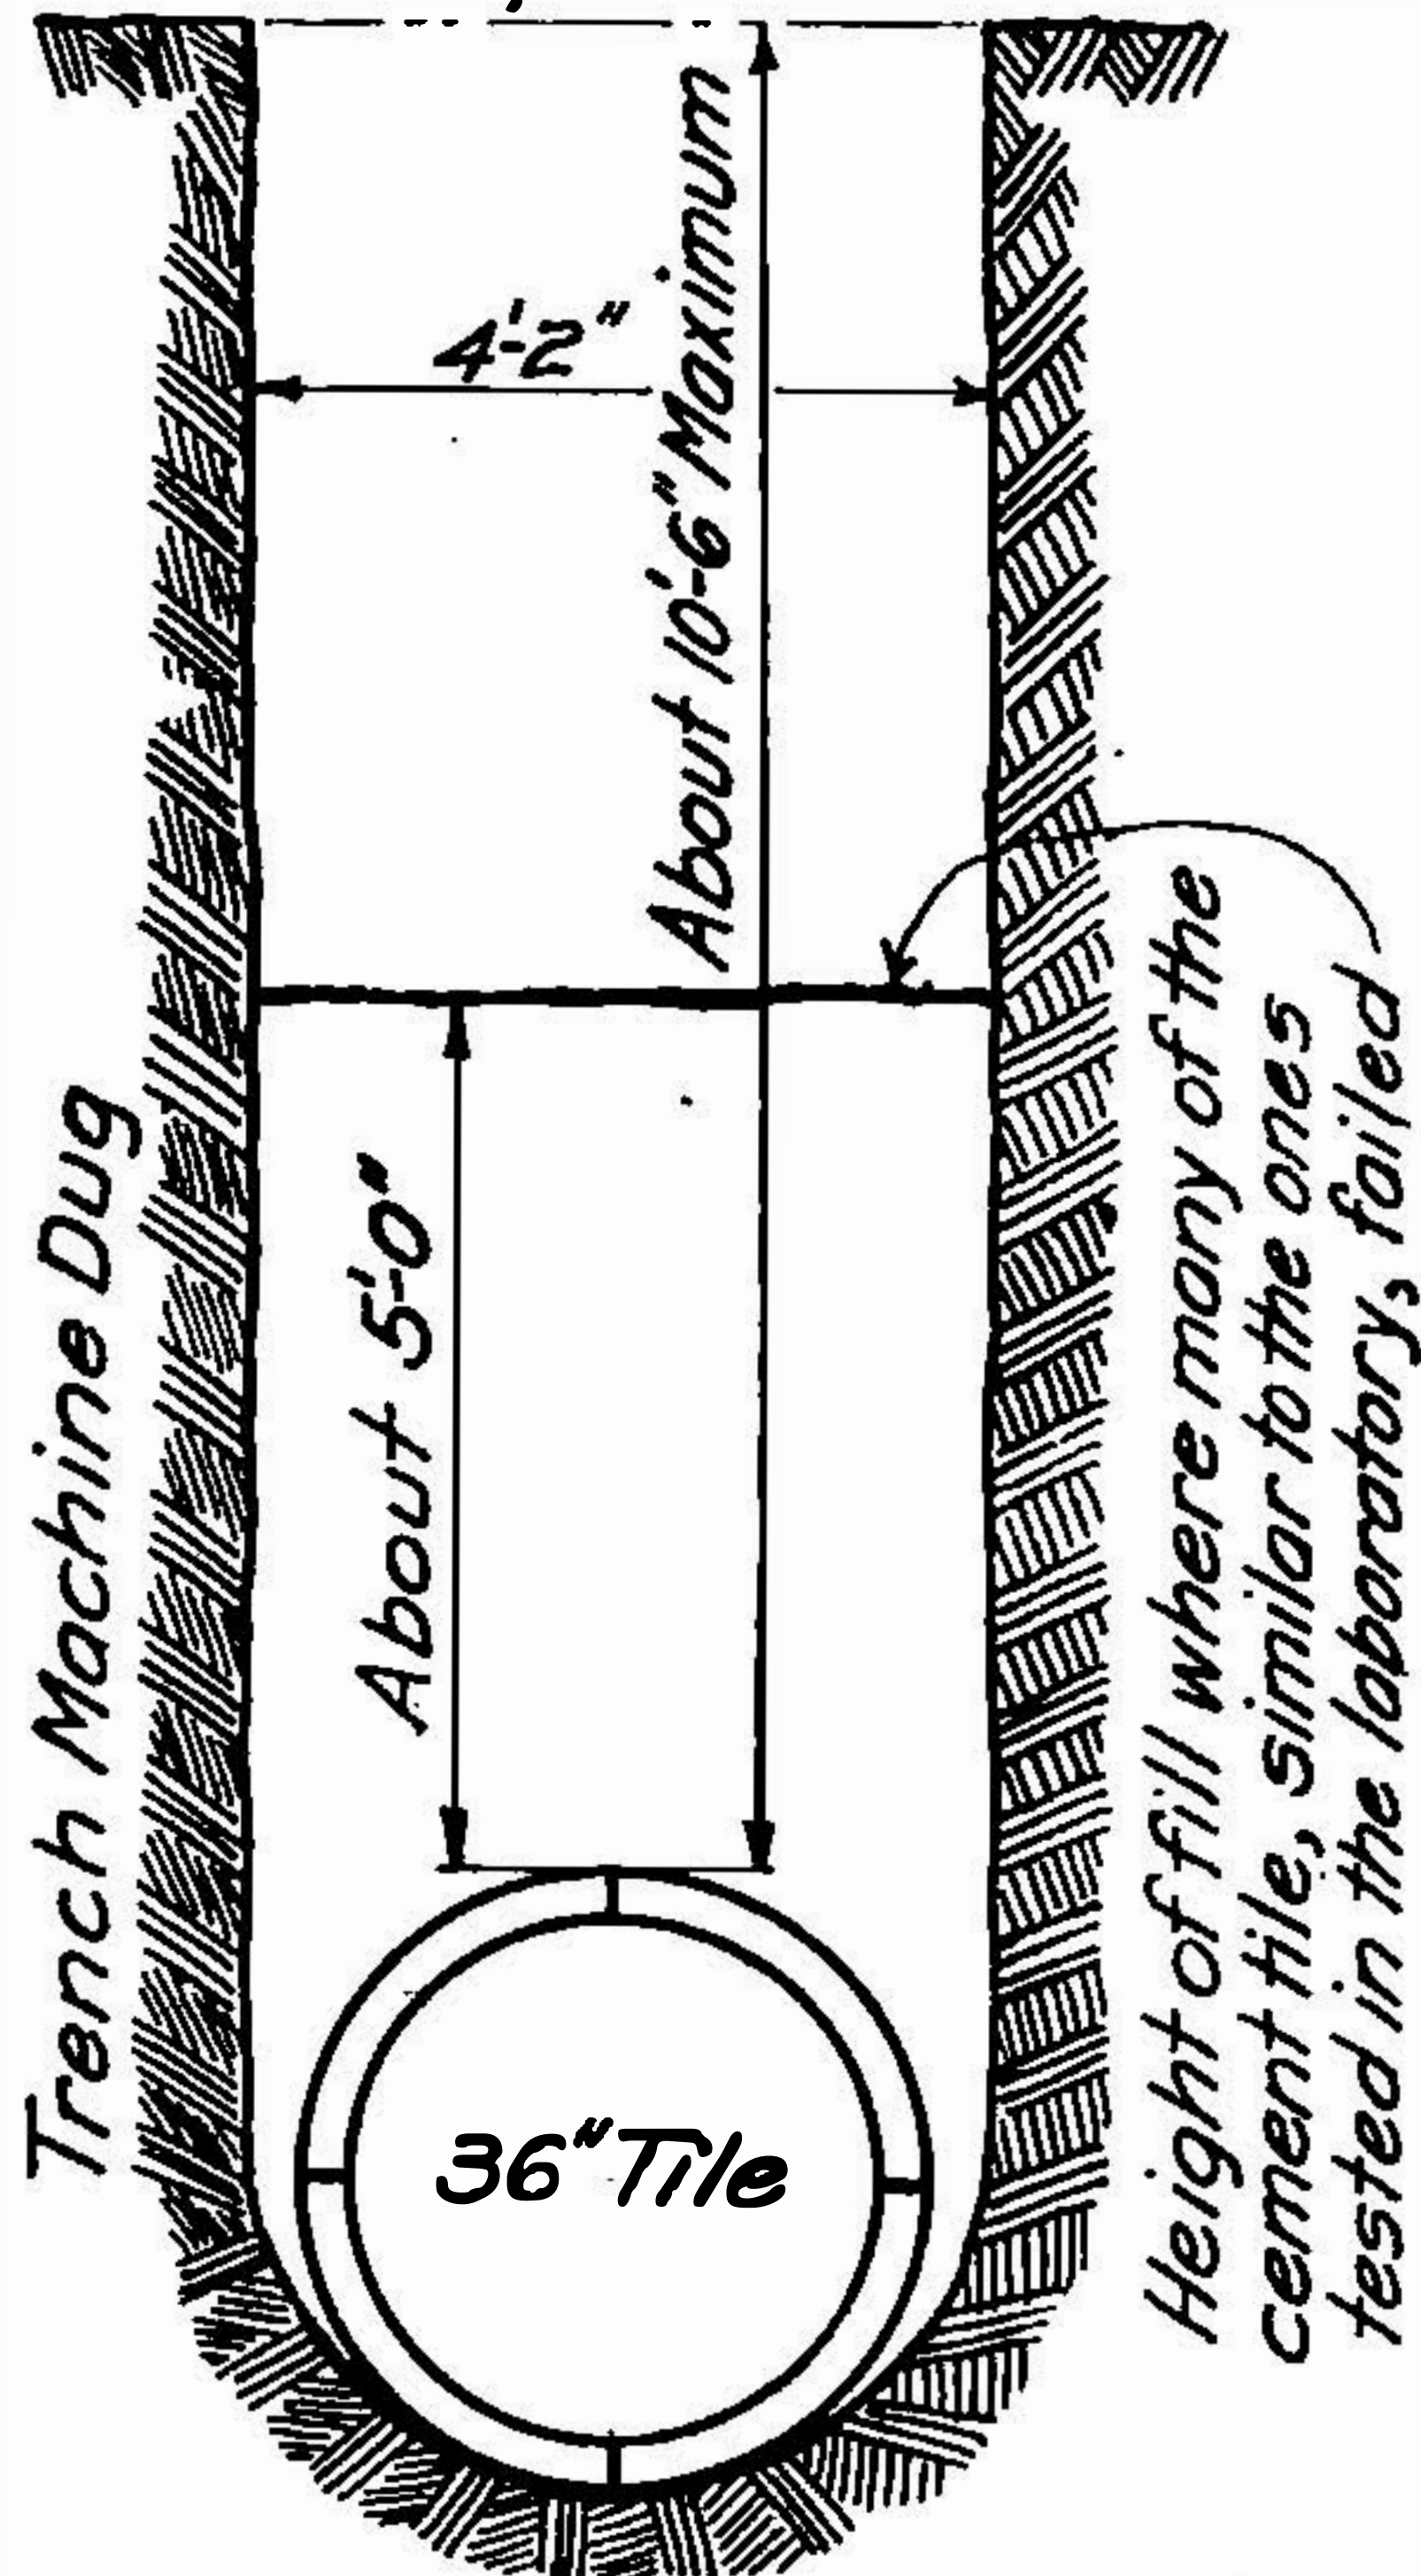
Cracking of 36 Inch Cement and Vitrified Clay Drain Tile during Construction, in Drainage District No. 29, Sac County, Iowa.
